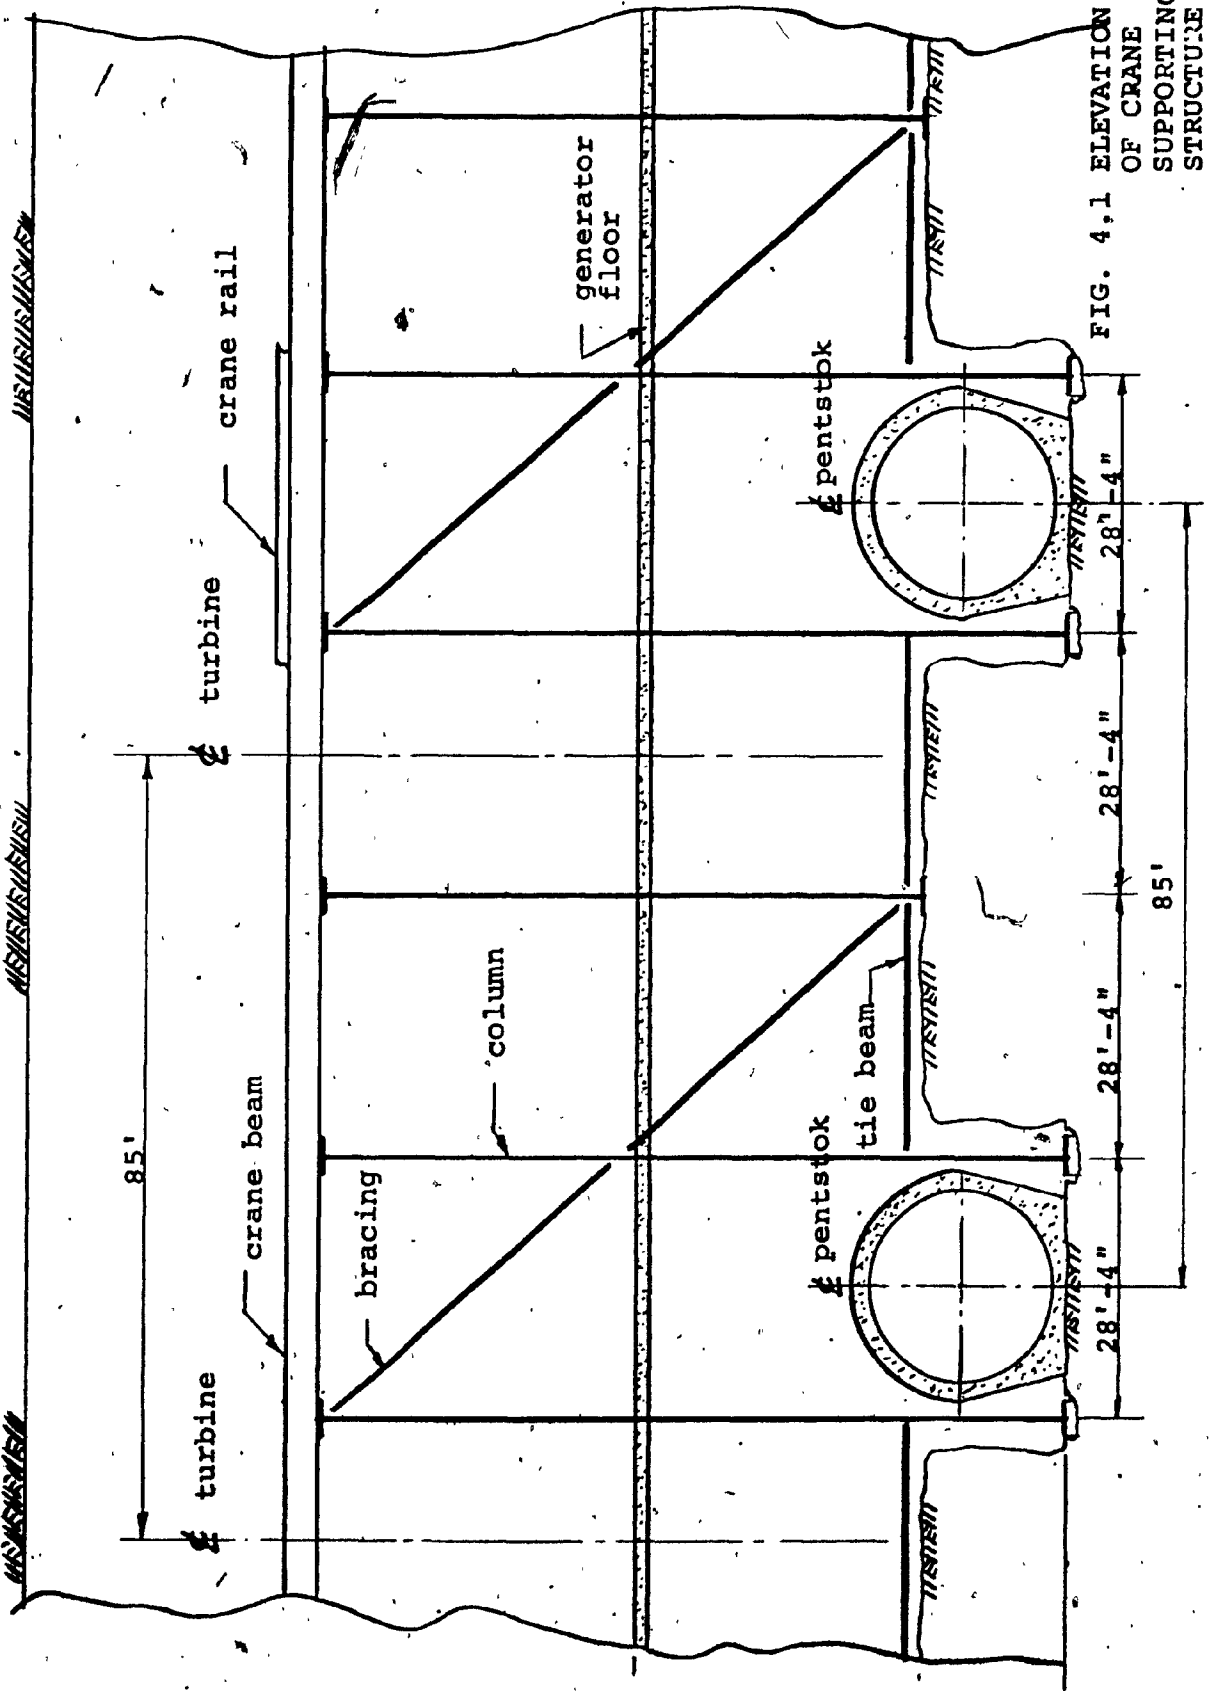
ELEVATION OF CRANE SUPPORTING STRUCTURE
